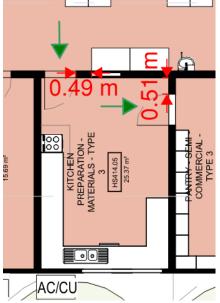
Kitchen Prep. Area Ground Floor Doorway Circulation
